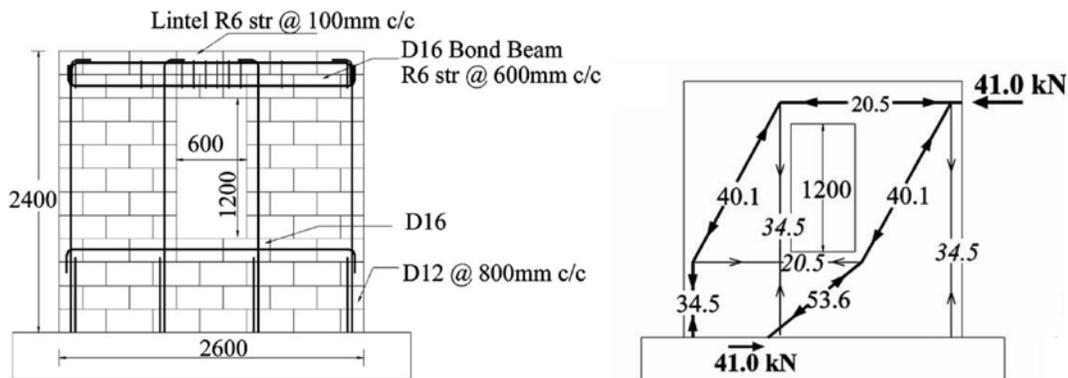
Strut-and-tie model for the reinforced masonry wall with an opening [19]
